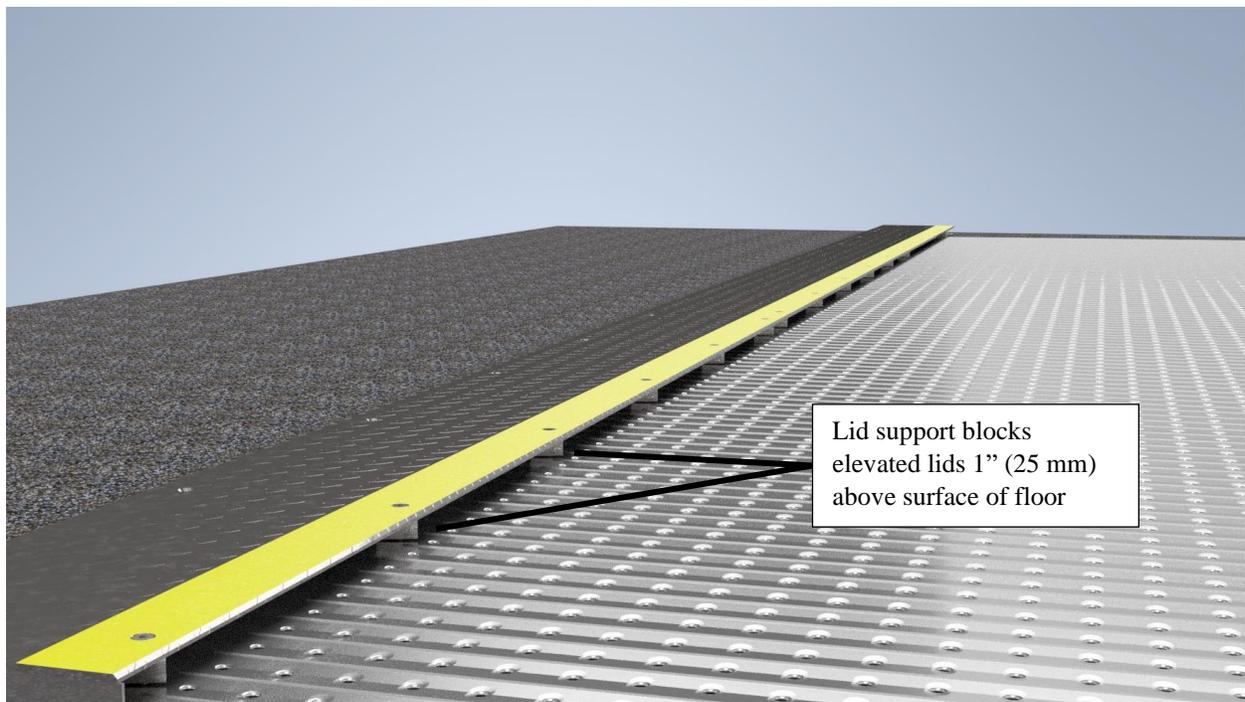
Trench drain lids elevated 1" (25 mm) above floor surface to allow liquid to flow directly into trench drain
